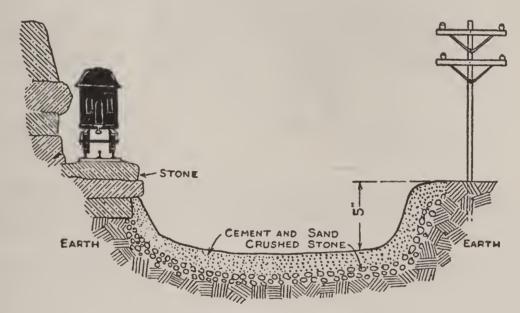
Cross-Section of Creek, with Ballasted Roadbed on Bank.
